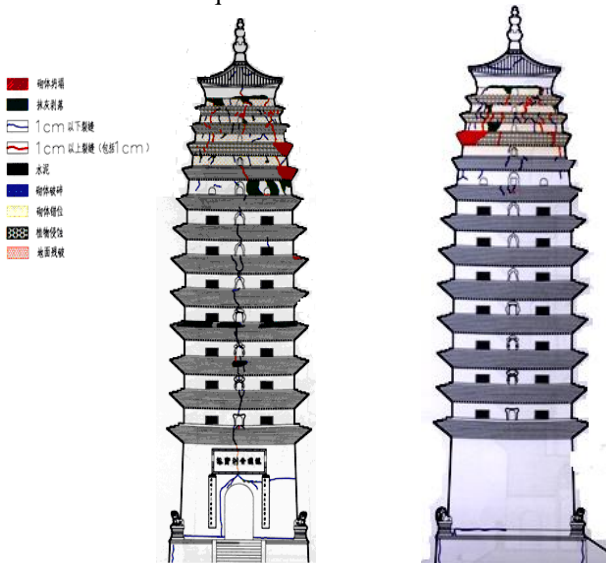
The elevation of a damaged masonry ancient pagoda
